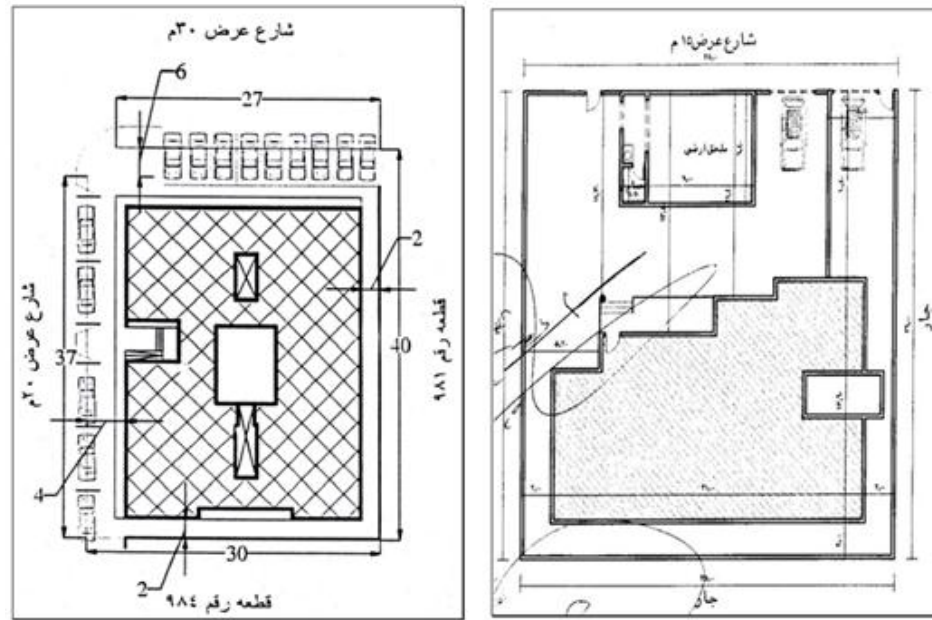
Geospatial building information identified in the plans including building footprint areas and setback distances to parcel boundaries and road centreline
